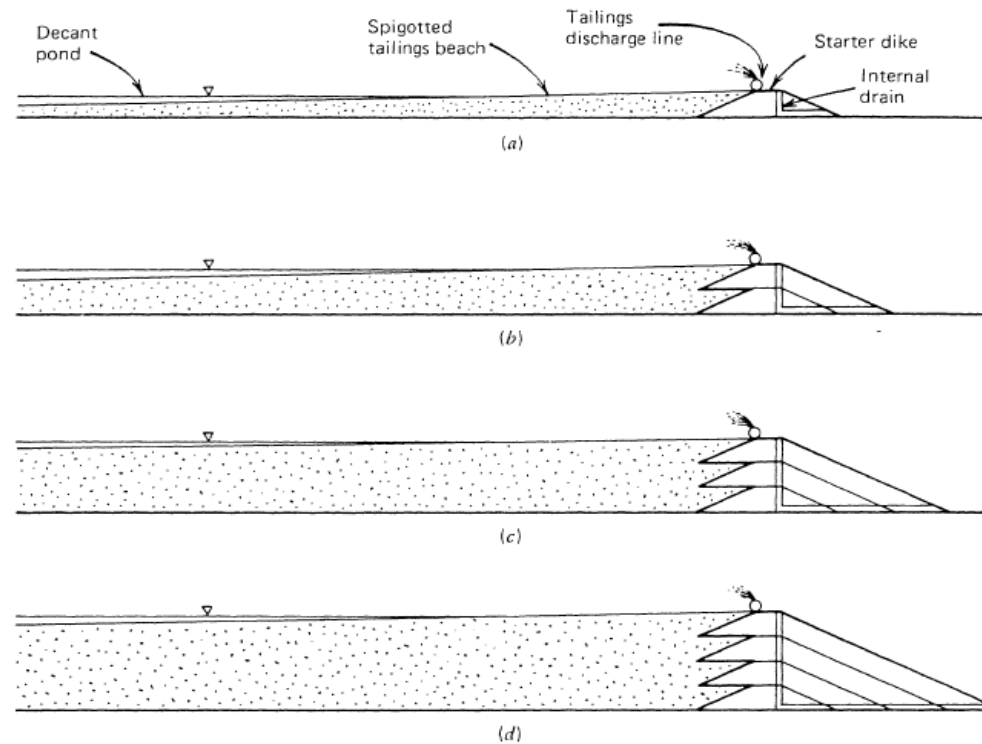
Sequential raising using the centerline raised embankment dam construction method (Vick, 1983)
